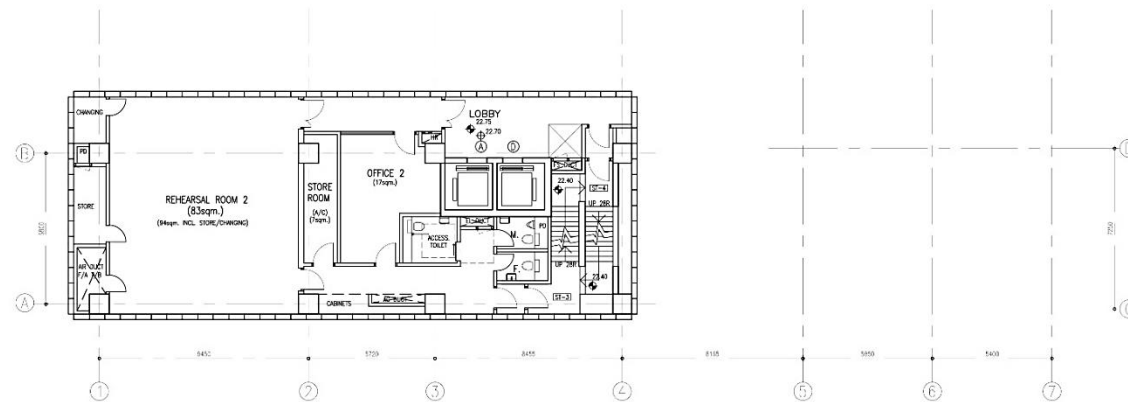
Proposed Upper Part of Ground Floor Plan (High Block and Low Block)
